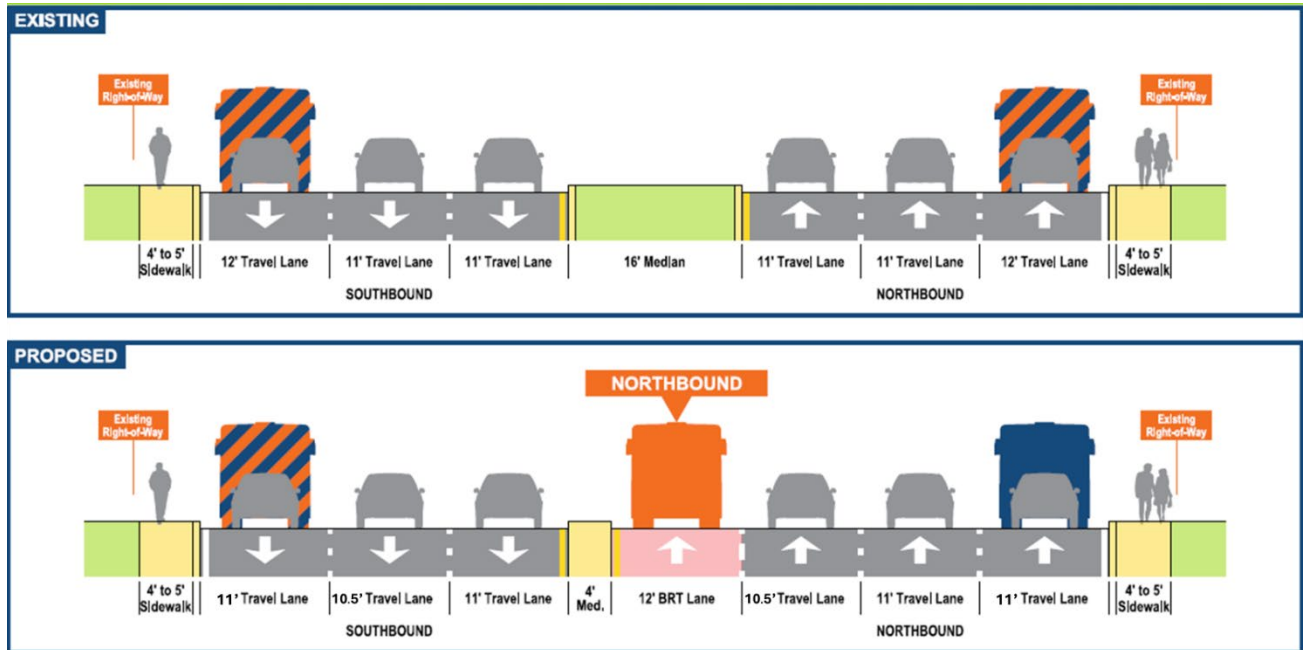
Existing/Proposed Cross-Section Inside the Beltway
